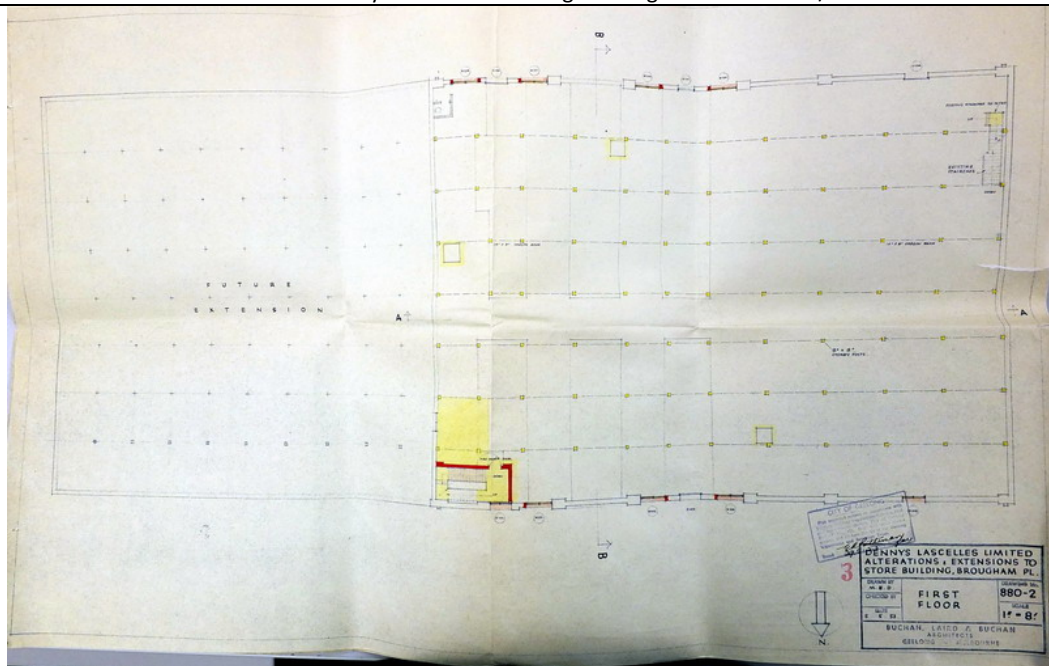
Buchan Laird & Buchan, First Floor Plan, proposed additions to Dennys Lascelles Ltd, 4 May 1953. Source: City of Greater Geelong Building Permit file 6828/53
